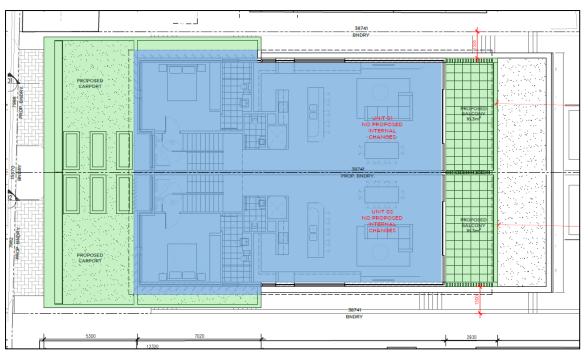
Carport roofs and balconies (Source: Architectural Plans prepared by AG Projects).
